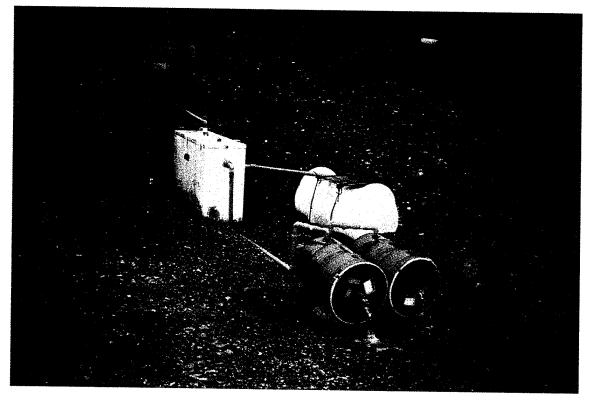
The sump consisted of a culvert with a welded metal base.
